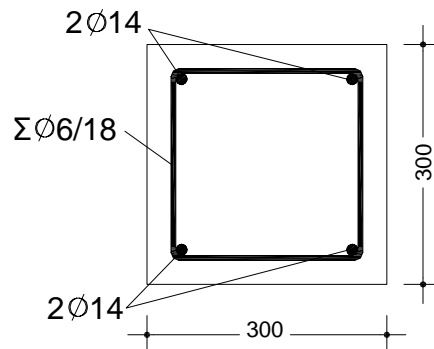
Dimensions of the cross-section and reinforcement layout of the RC columns (dimensions in mm).
